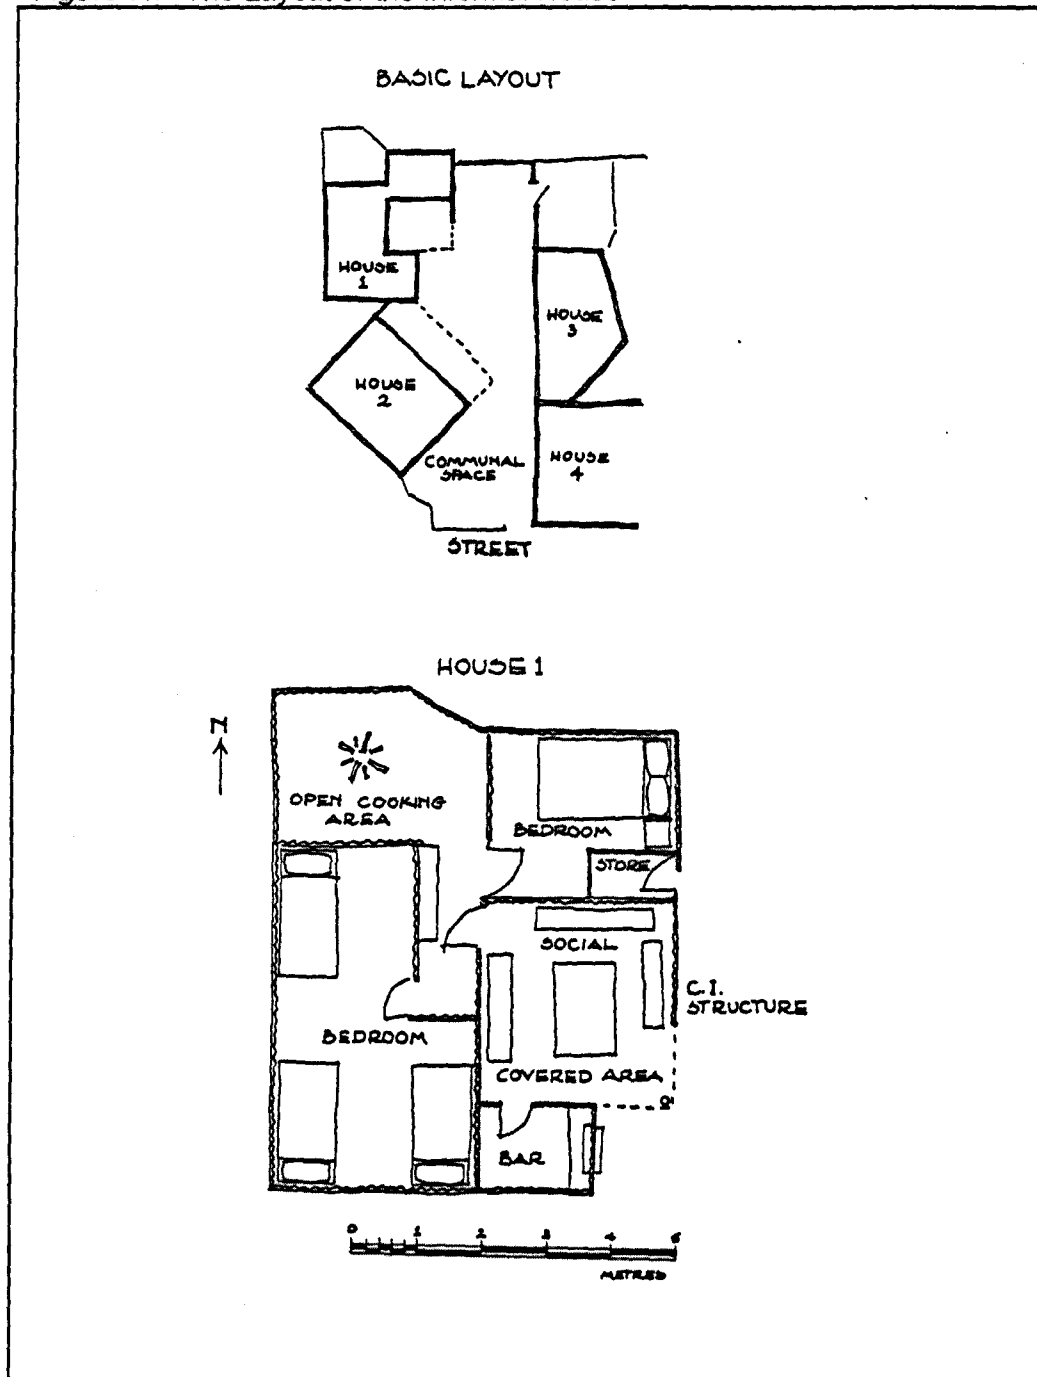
illustrates the layout and furnishing of the house. The house is built with corrugated iron sheets on a timber frame. It contains a meeting place, two sleeping places, a store, a cooking place and a kiosk with a service counter facing the meeting place. The entrance space of the informal house forms a courtyard that also serves as an entrance space to other shelters. Big drums with water are stored in this space.
